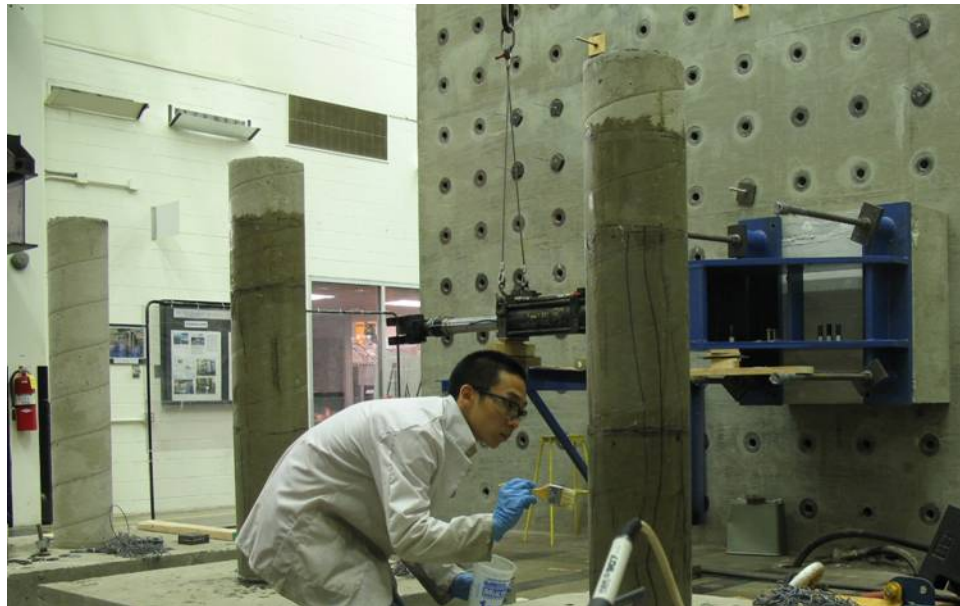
Retrofitting RC columns with GFRP/epoxy sheets using hand lay-up method.
